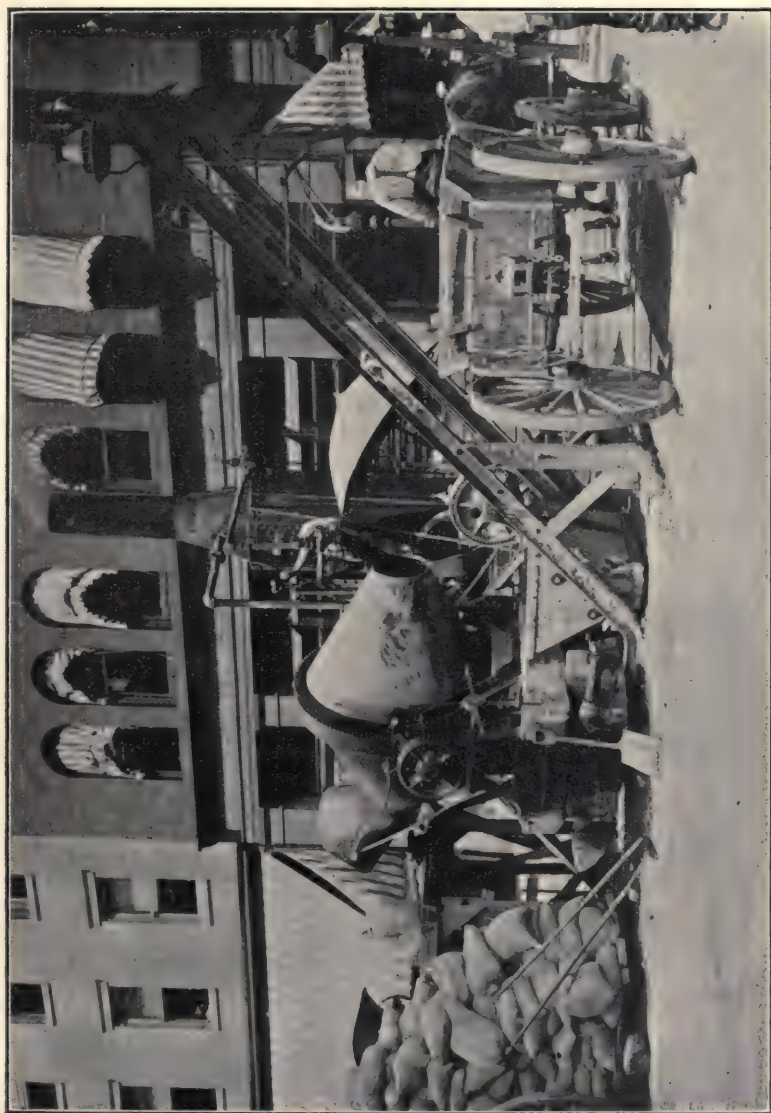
Modern Portable Cement Concrete Mixing Plant.
